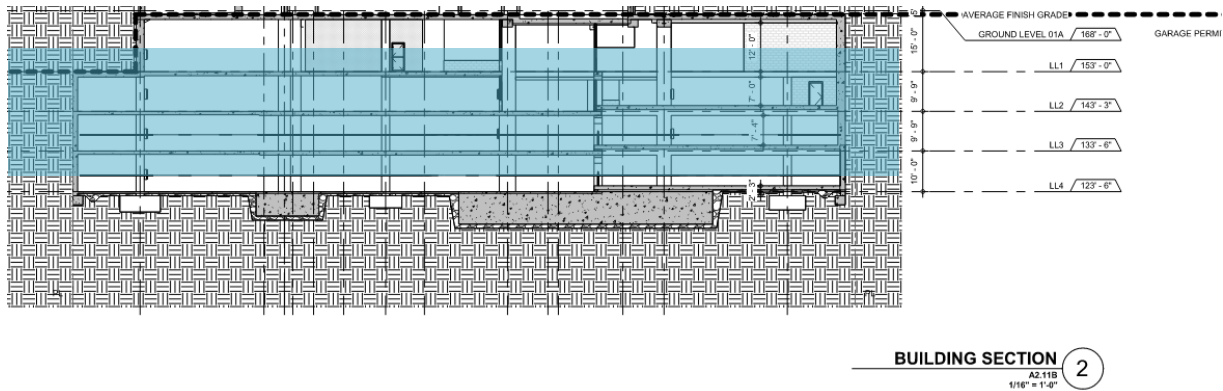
Image from The Eight parking garage permit set. The discontinuous groundwater elevations observed at The Eight are shown graphically in blue to demonstrate that the parking garage spans the shallow groundwater elevations and that any discontinuous shallow groundwater that was present prior to development was removed during construction.
